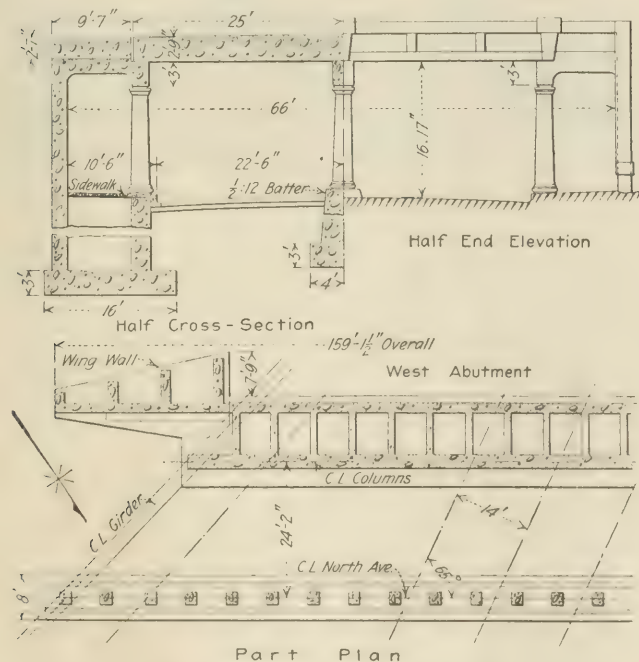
SUBWAY OF REINFORCED-CONCRETE AT NORTH AVE., AURORA, ILL.
